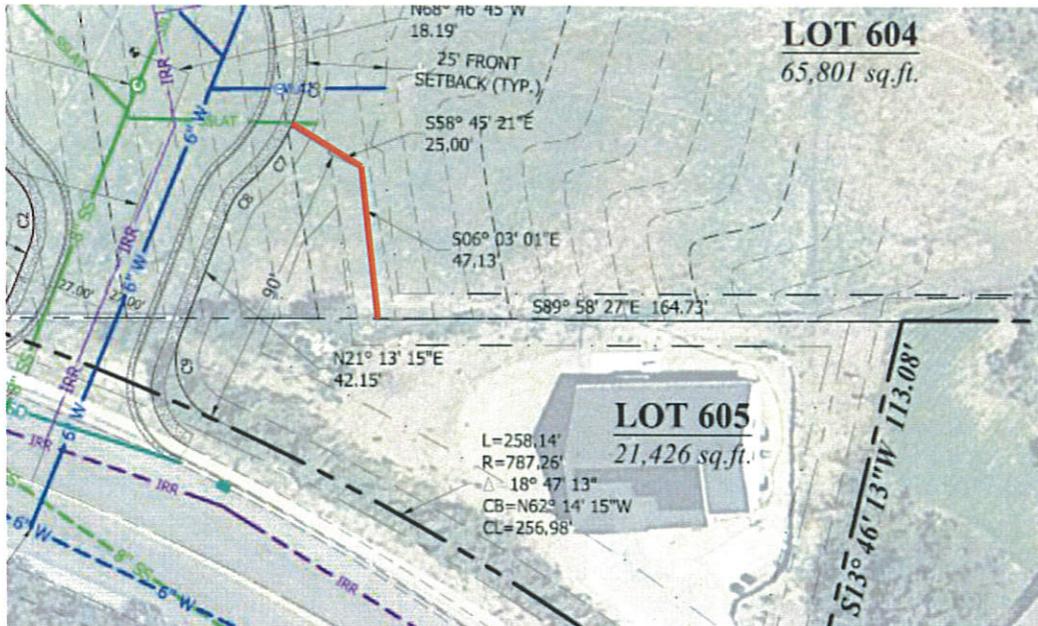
Original proposed configuration of Lot 605 meeting corner frontage requirement.
